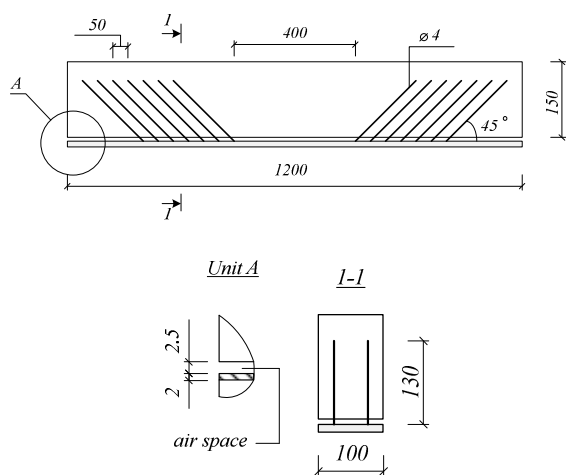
The design model of examined beams with external steel sheet reinforcement
